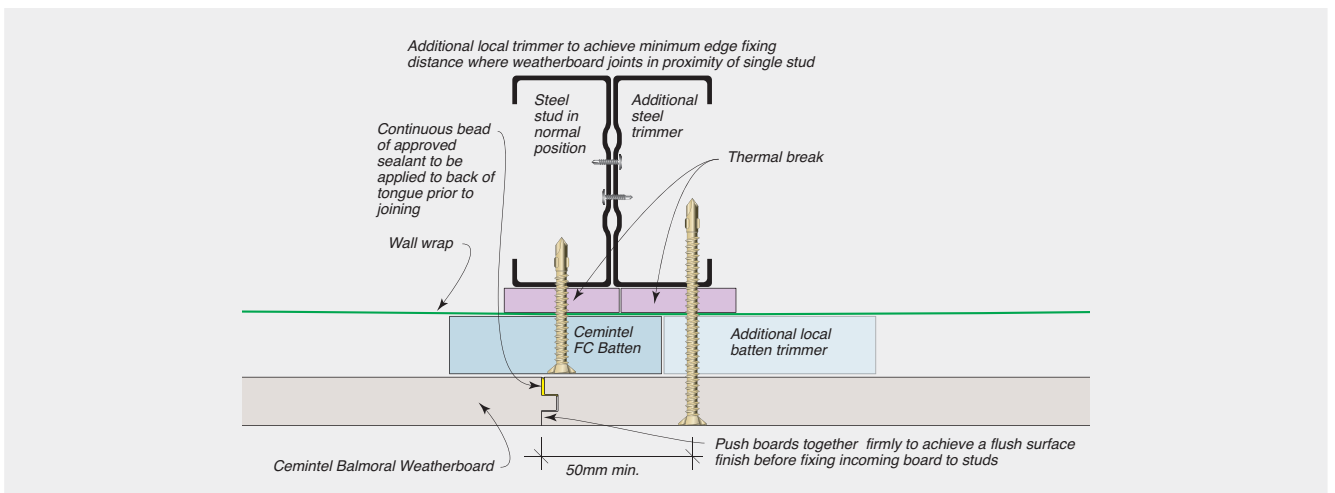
Typical Vertical Joint Aligned to Steel Stud with Local Trimmer
